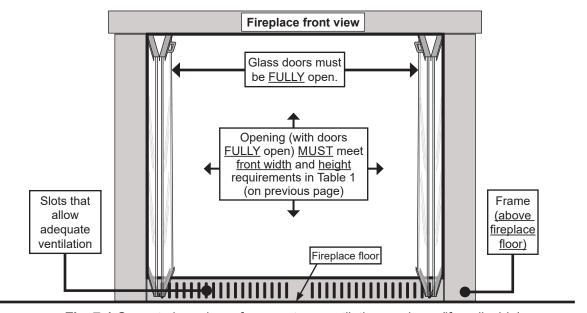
Correct glass-doors frame setup, ventilation, and use (if applicable)
